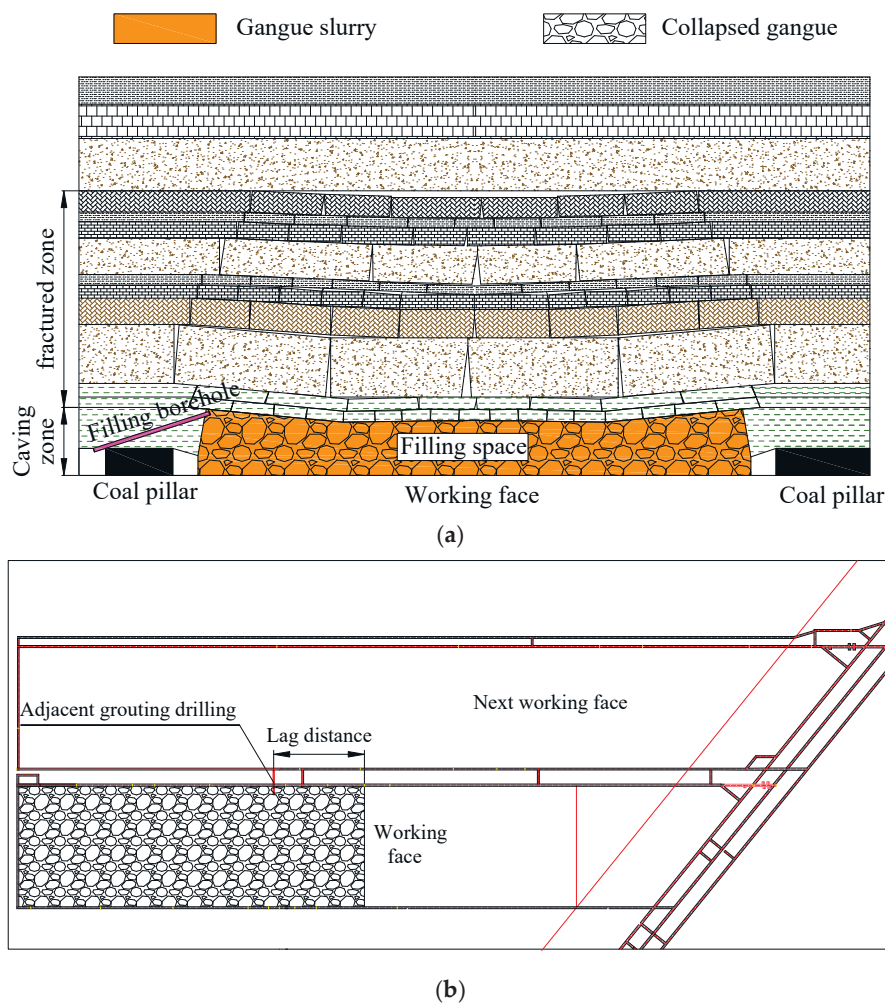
Schematic diagram of adjacent grouting filling technology: (a) profile; (b) plan.
